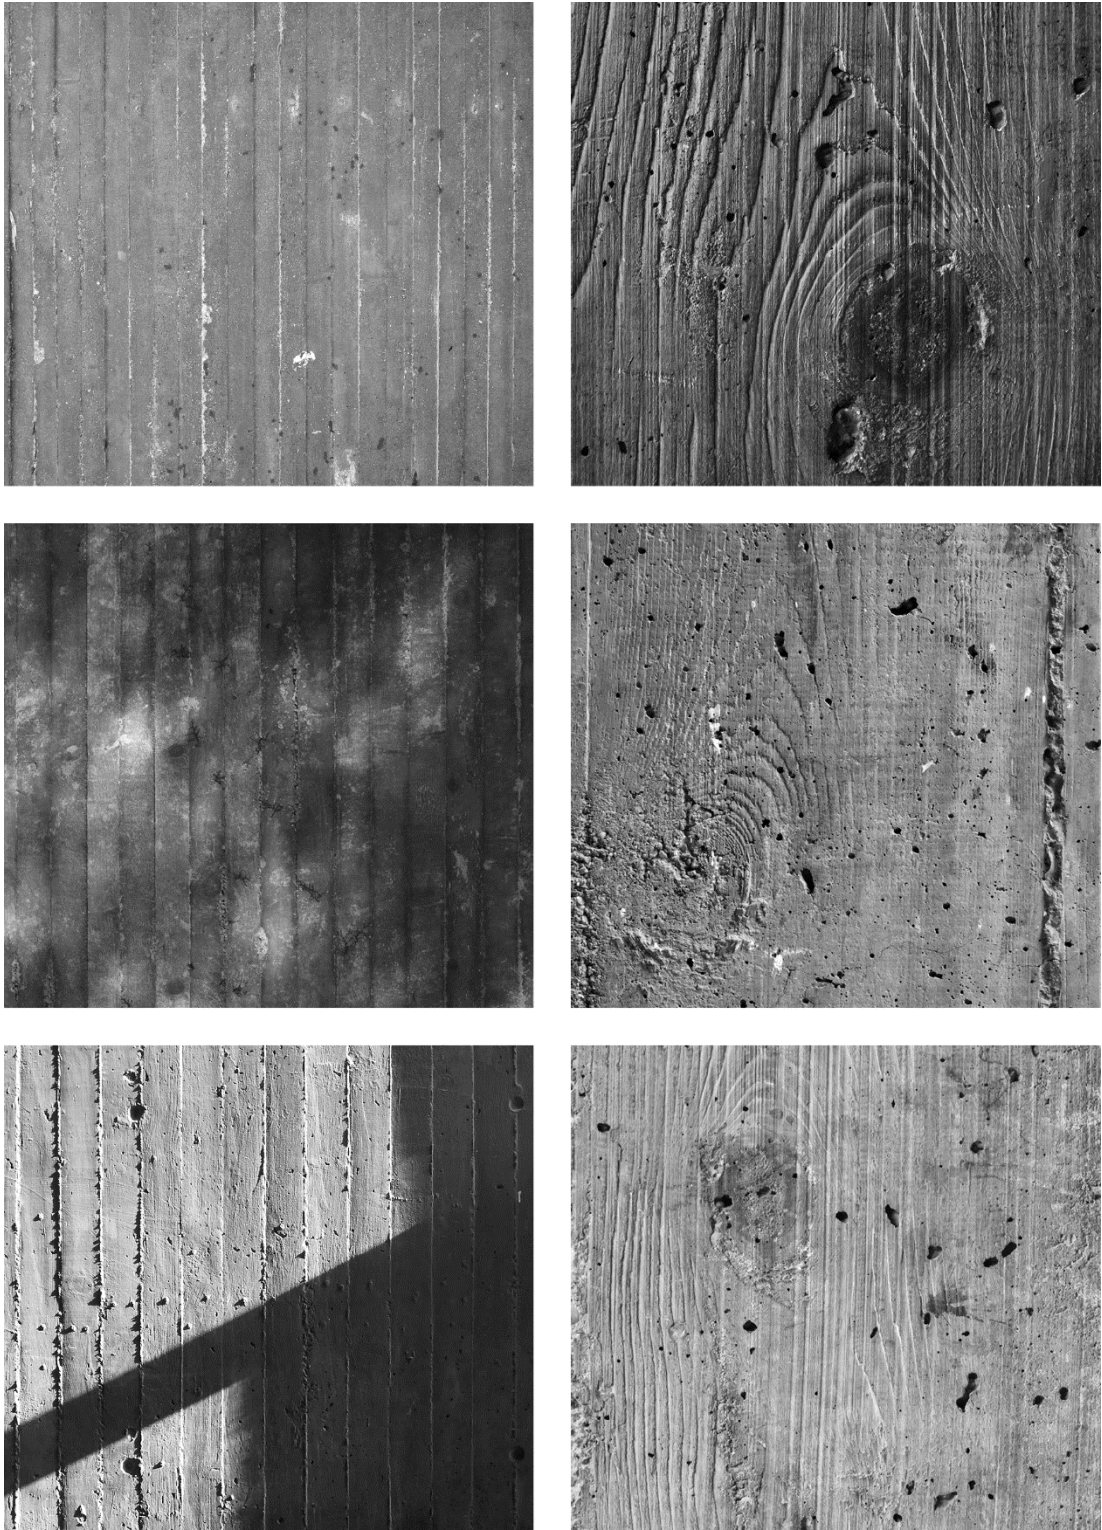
Close up photographs of the exposed concrete walls of Faculty building.
